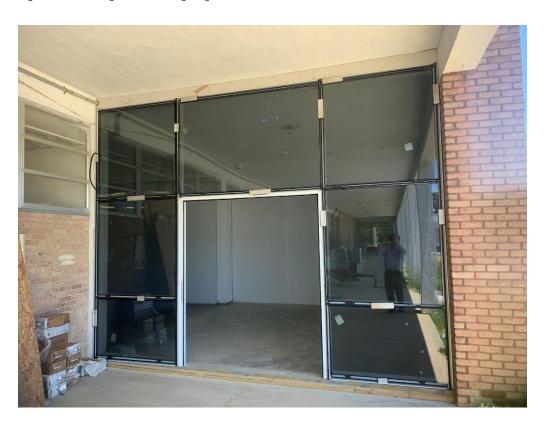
Curtain Wall Progress at Upper Floor Entry
